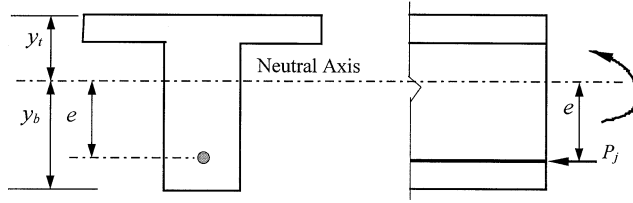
Prestressed concrete member section at Service Limit State.
